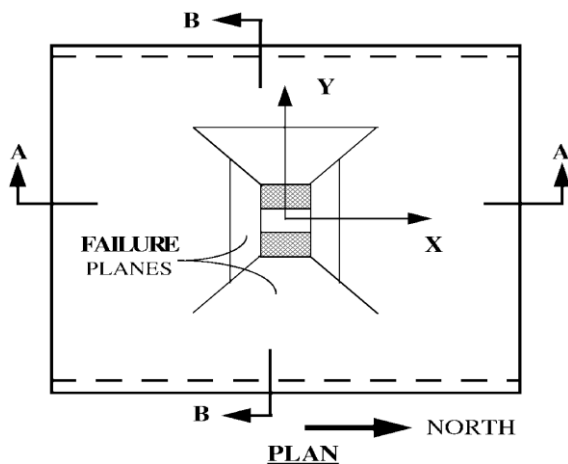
Schematic plan view of combined failure mode for precast specimens [12]
